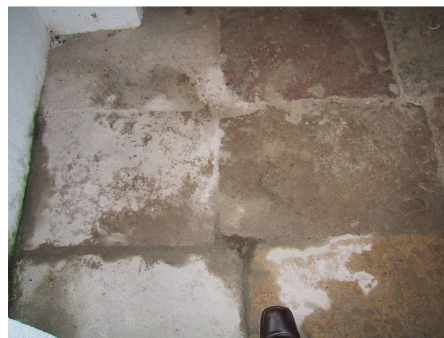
Moisture stains on the stone floor of the mill ground floor
